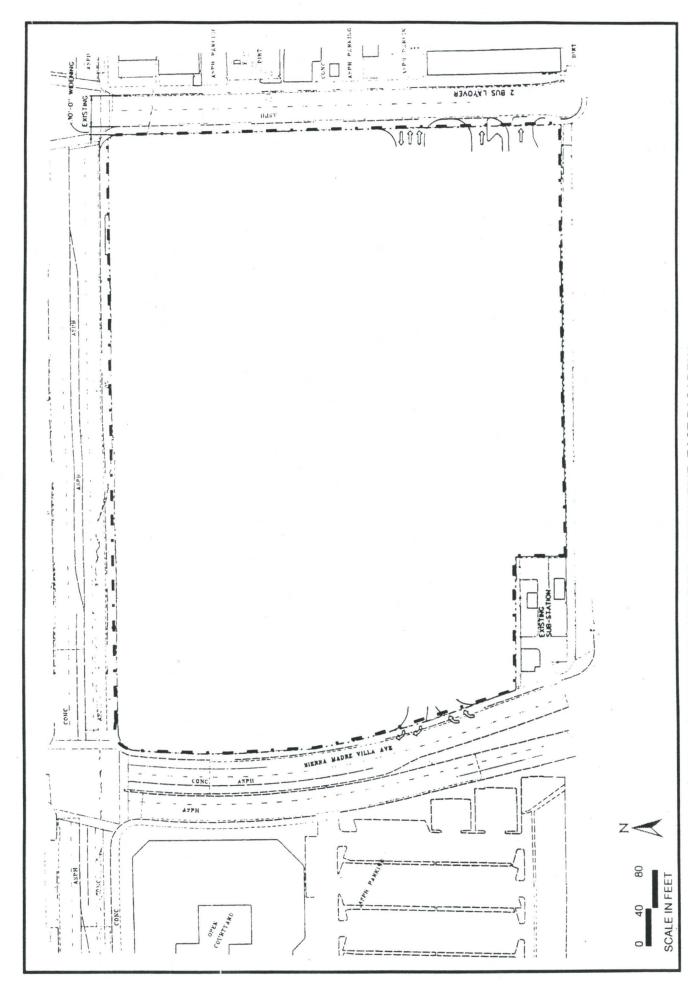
JOHNSON & JOHNSON/MERCK PARK AND RIDE ALTERNATIVE, EAST PASADENA
